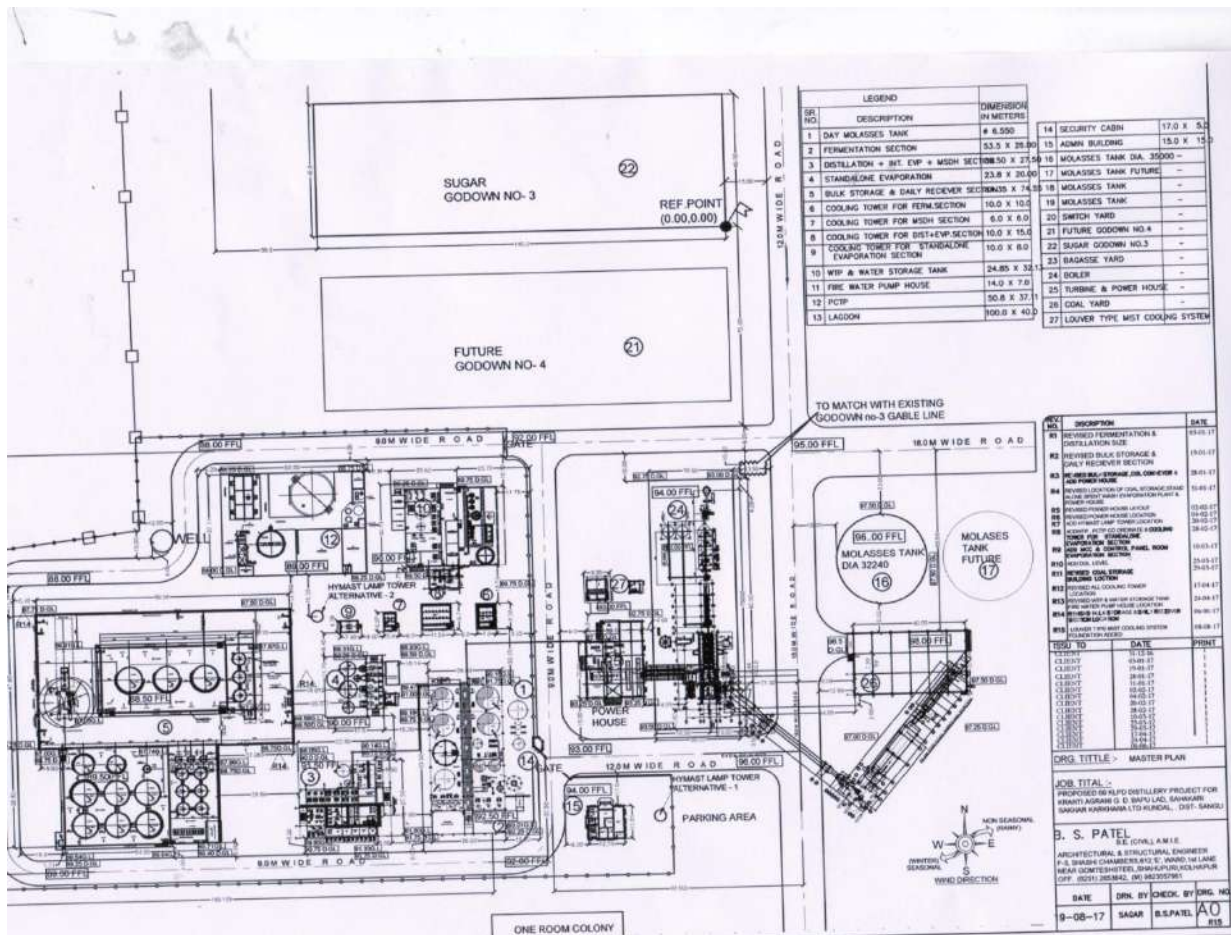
Project Layout (proposed expansion will be within the existing distillery unit)
